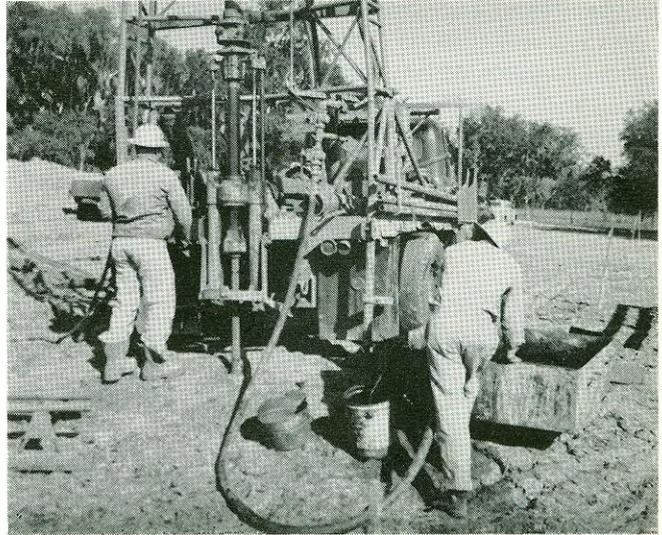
Eustis Engineering Company drilling rig making test borings at Rockefeller Refuge new headquarters site.
